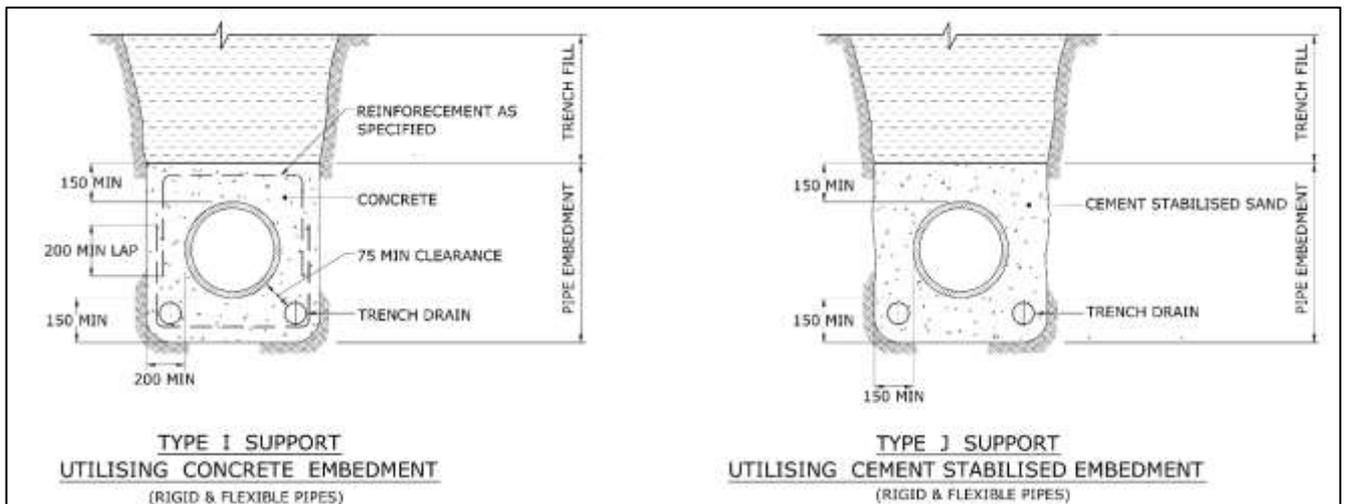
TYPICAL CONCRETE ENCASEMENT EMBEDMENT DETAILS
